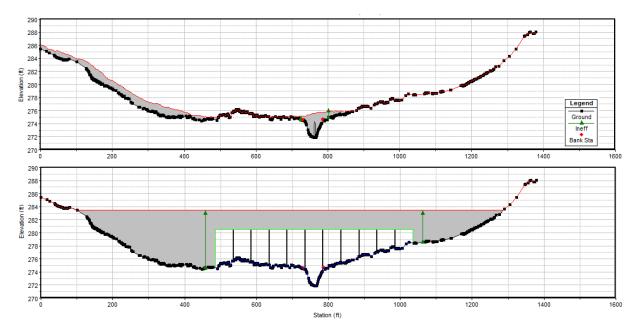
Alternative PA2 Existing and Proposed Structure Cross-Sections at North Reids Prairie Road
